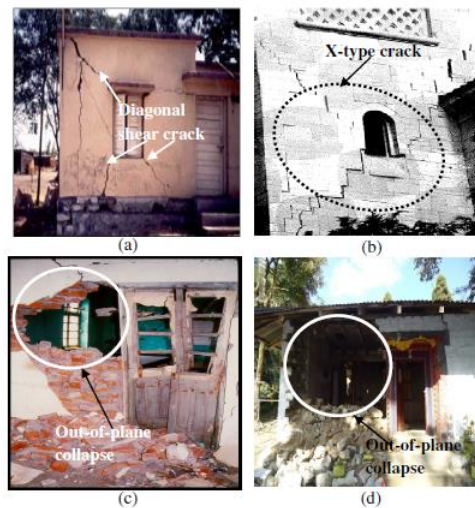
Different damage examples of masonry wall with openings, (a) diagonal shear crack, (b) X shaped crack, (c, d) Out-of-plane collapse (Nayak and Dutta, 2015)
